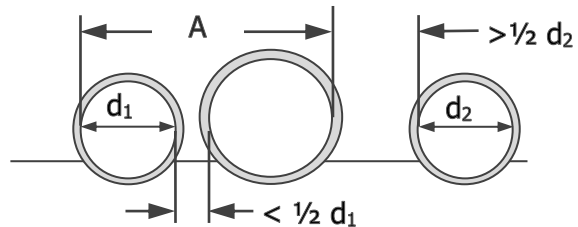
Profile view of a multi-pipe bridge under fill, or culvert under fill.
